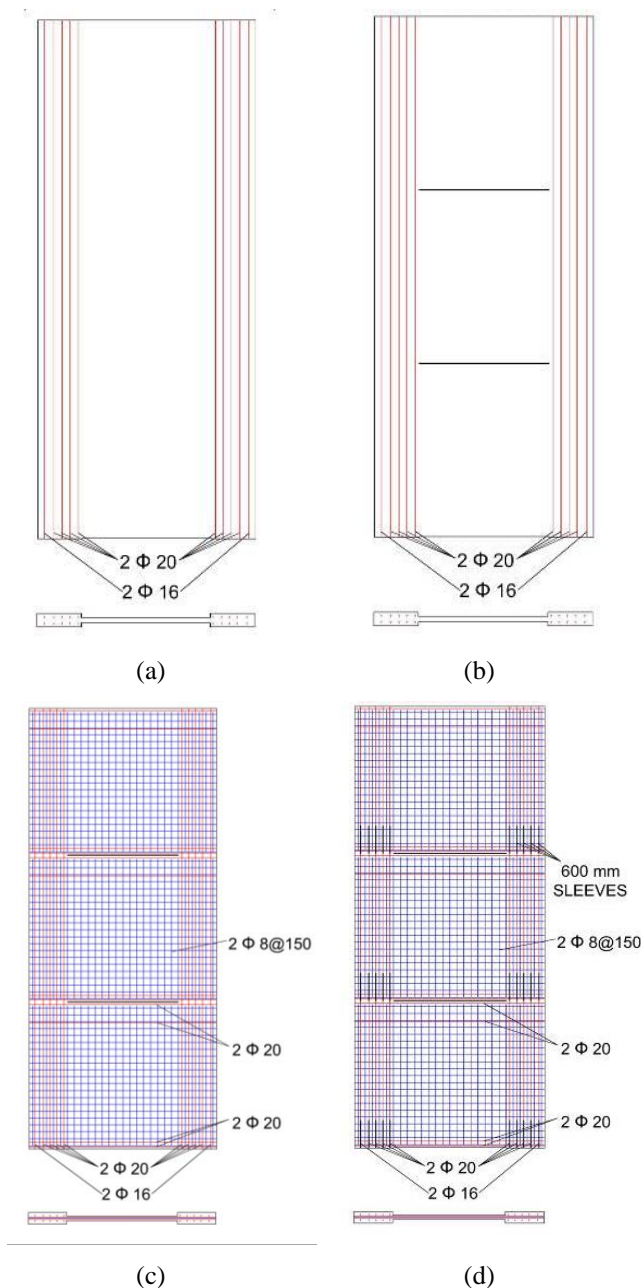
Wall configurations: (a) plain wall (cast-in-situ equivalent), (b) precast wall without shear reinforcement, (c) precast wall with shear reinforcement, (d) precast wall with shear reinforcement and de-bonding sleeves / Configurazioni del muro: (a) gettato in opera equivalente, (b) prefabbricato non armato a taglio, (c) prefabbricato armato a taglio, (d) prefabbricato armato a taglio con guaine.
